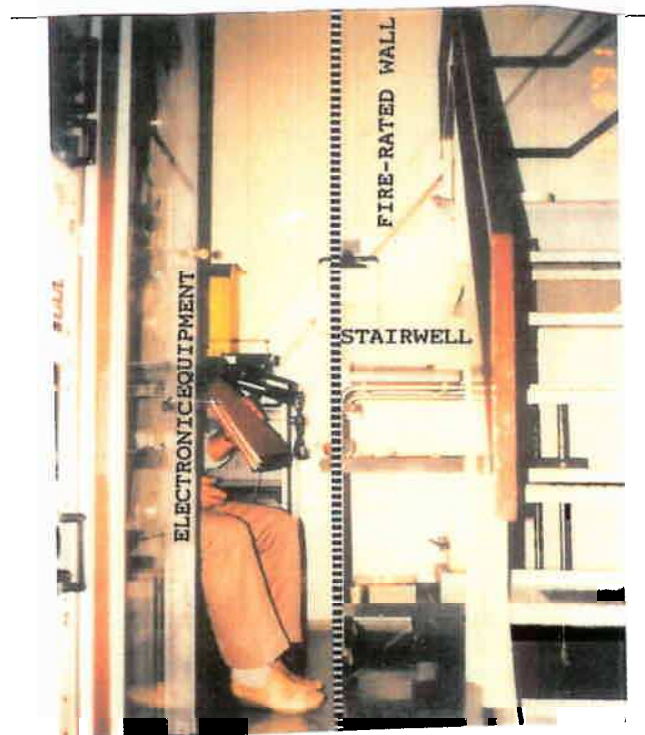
Fire-Rated Wall Installed to Separate Stairwell and Electronic Equipment (Hunt-Avco)
